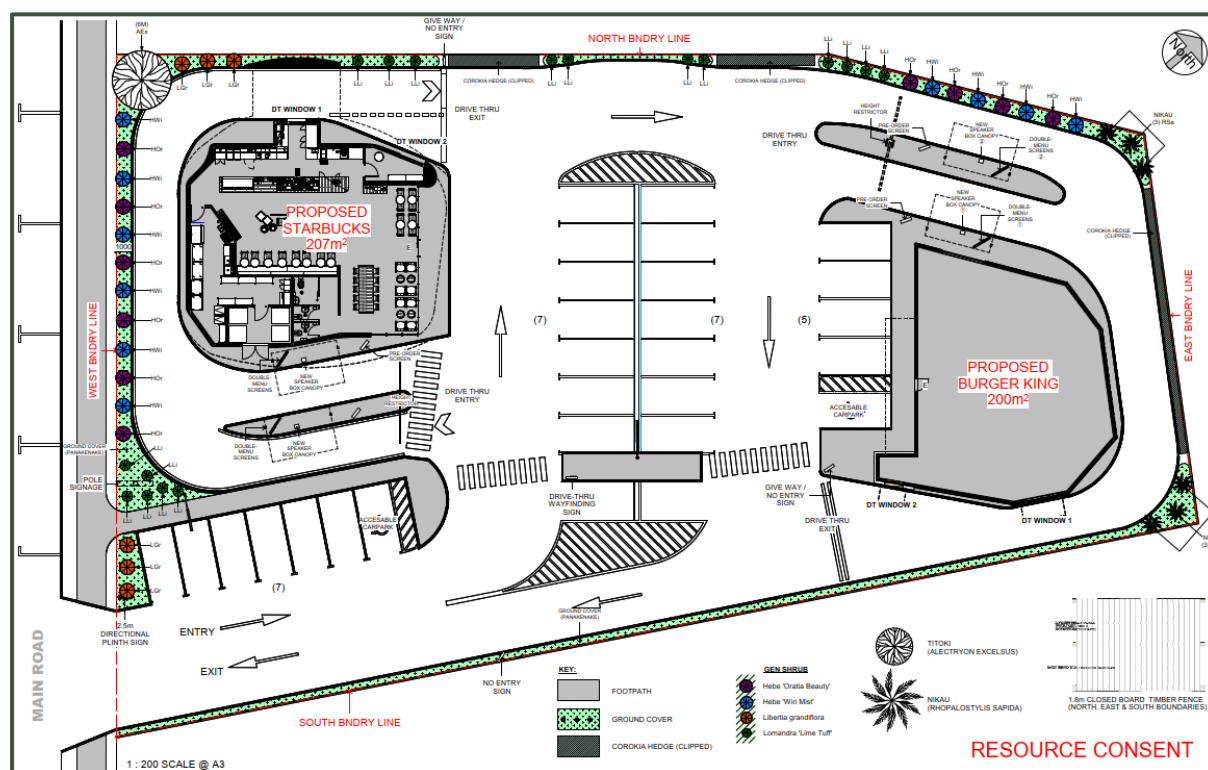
Proposed Landscaping Arrangement (source: Appendix D)
